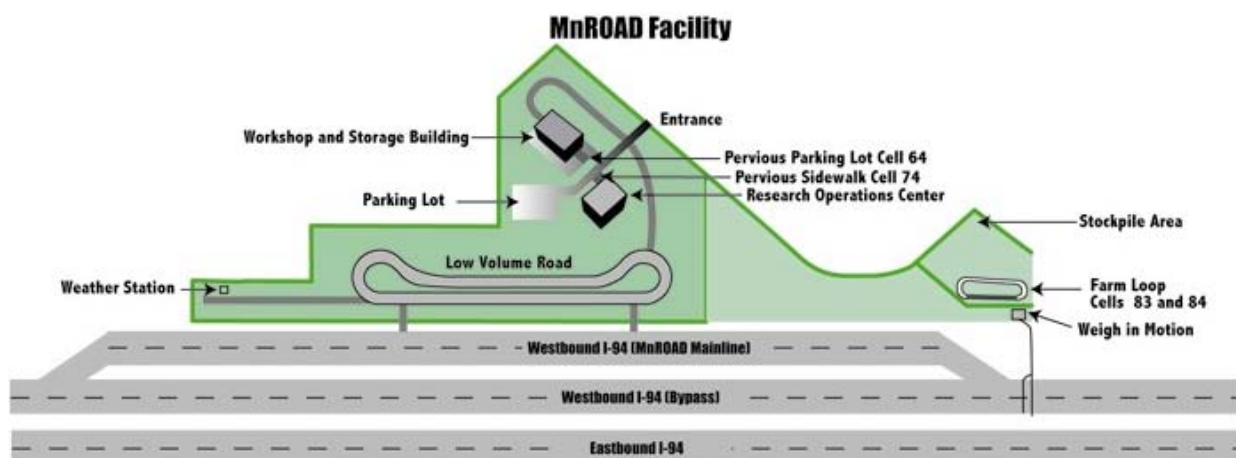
MnROAD facility layout (<http://www.dot.state.mn.us/mnroad/>).
